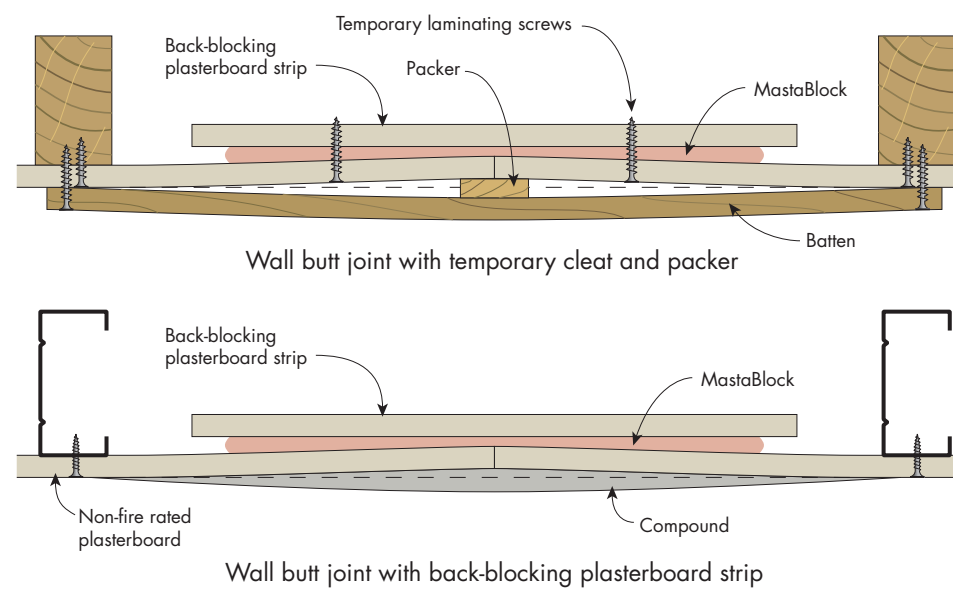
Creating a Recess at a Wall Butt Joint Using Laminating Screws – Plan View
